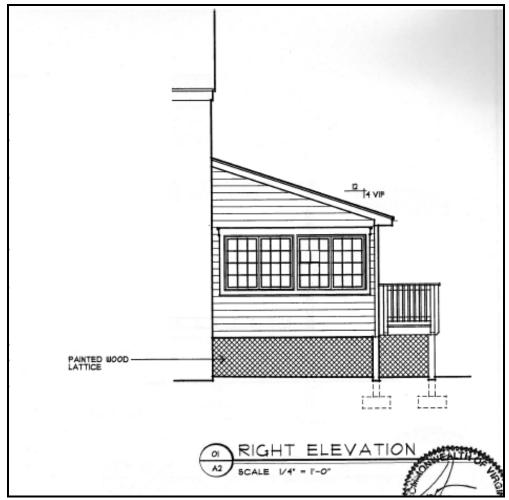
Drawing of the enclosed porch viewing from Right Elevation
